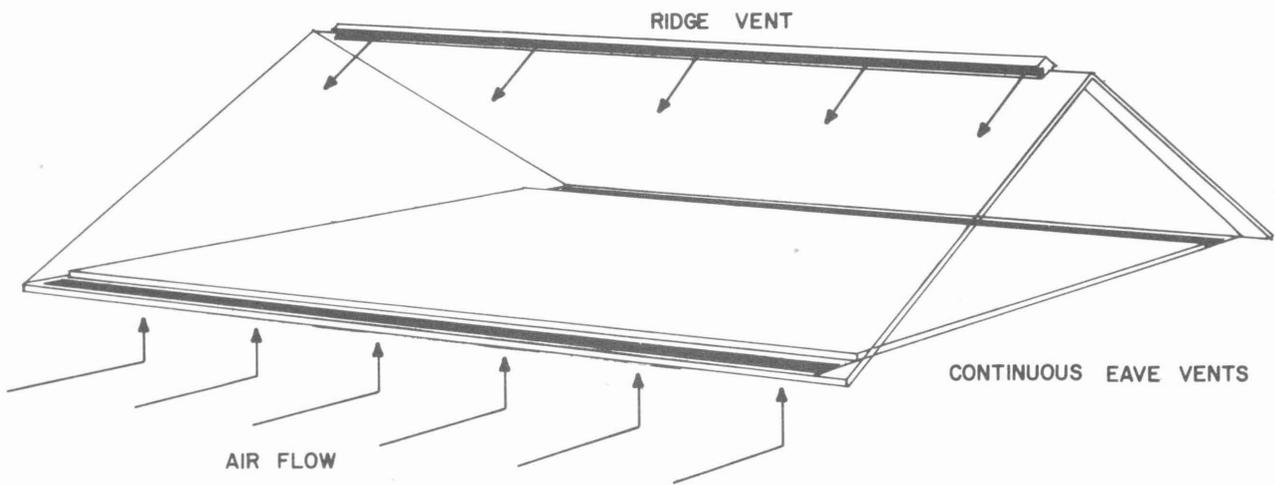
Attic ventilation for removal of excess heat will serve adequately for attic moisture control.
